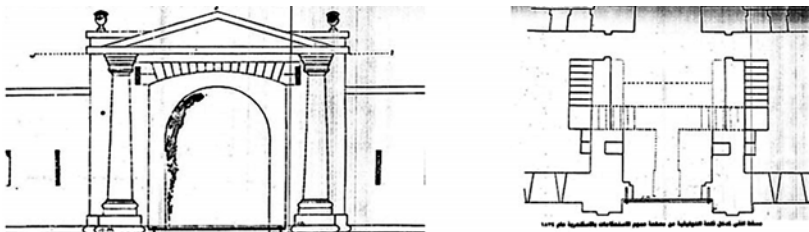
Entrance gate. Elevation and plan dated to 1874 A.D. [5]
